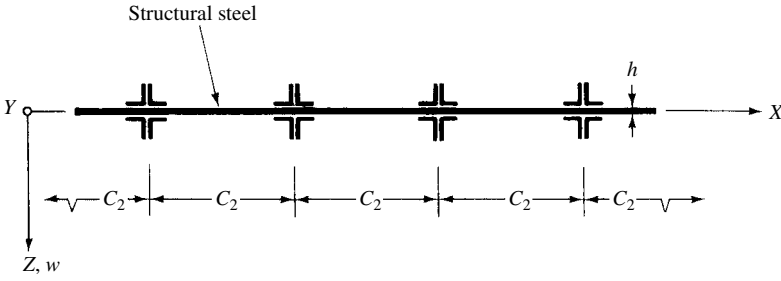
Section of plate reinforced with multiple stiffeners in Y direction.
